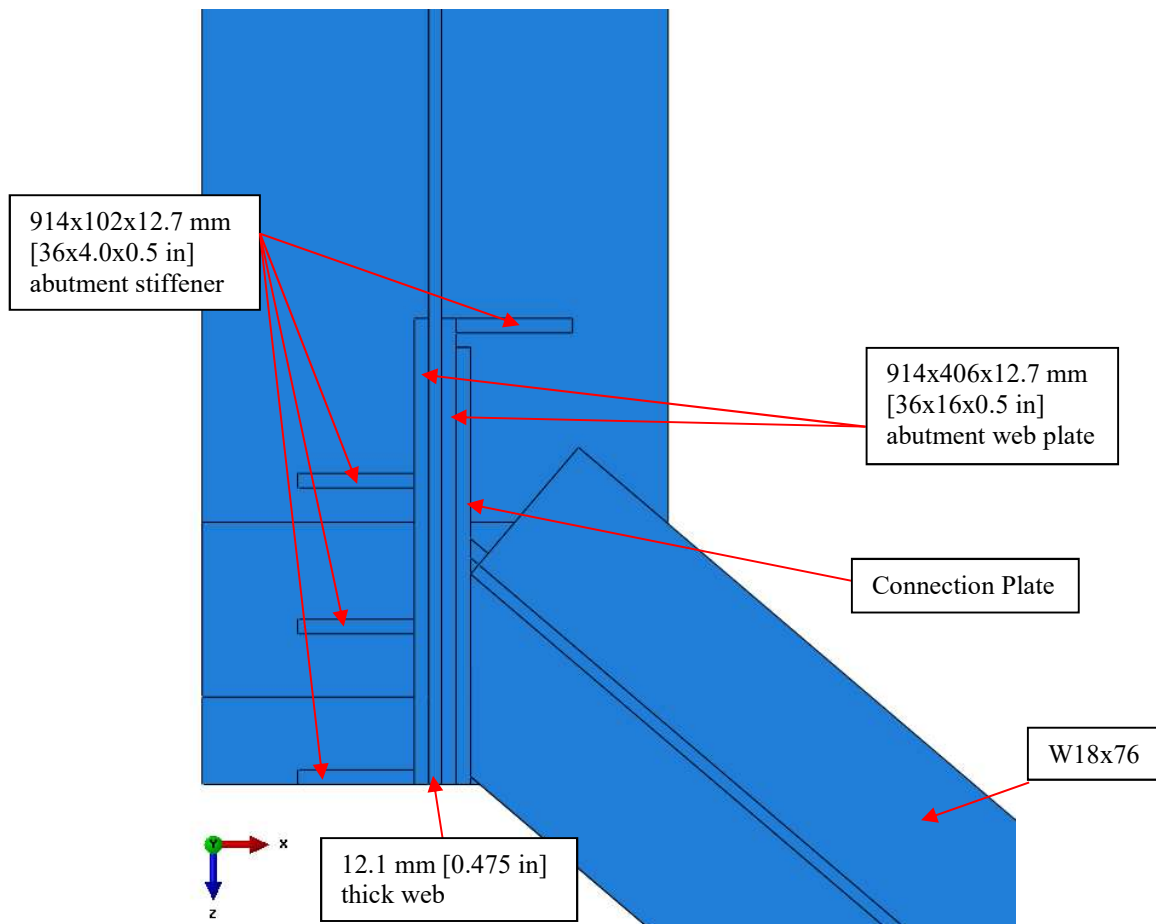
Plan view of exterior girder at the abutment showing girder and diaphragm connection plates
